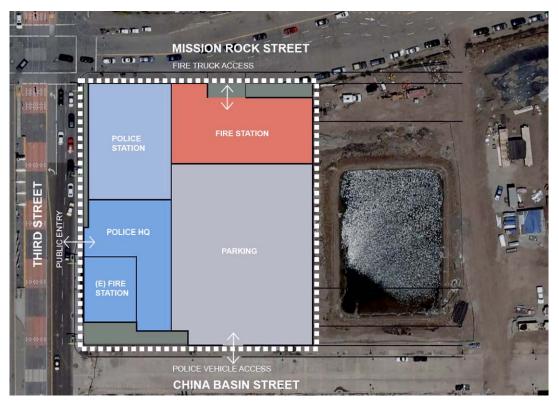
Mission Bay Public Safety Building—Pedestrian and Vehicular Access (Source: SF Justice Facilities Improvement Study, December 2008)
